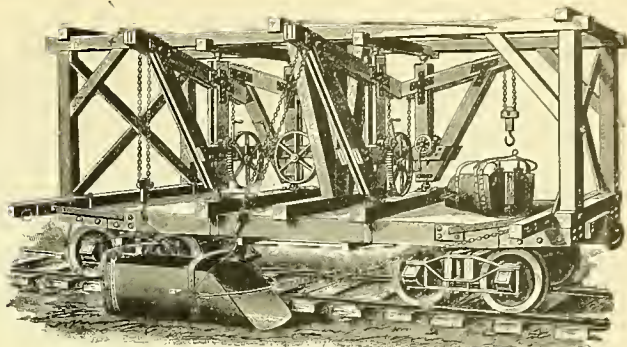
RAILROAD DITCHING CAR, THE AMERICAN.
